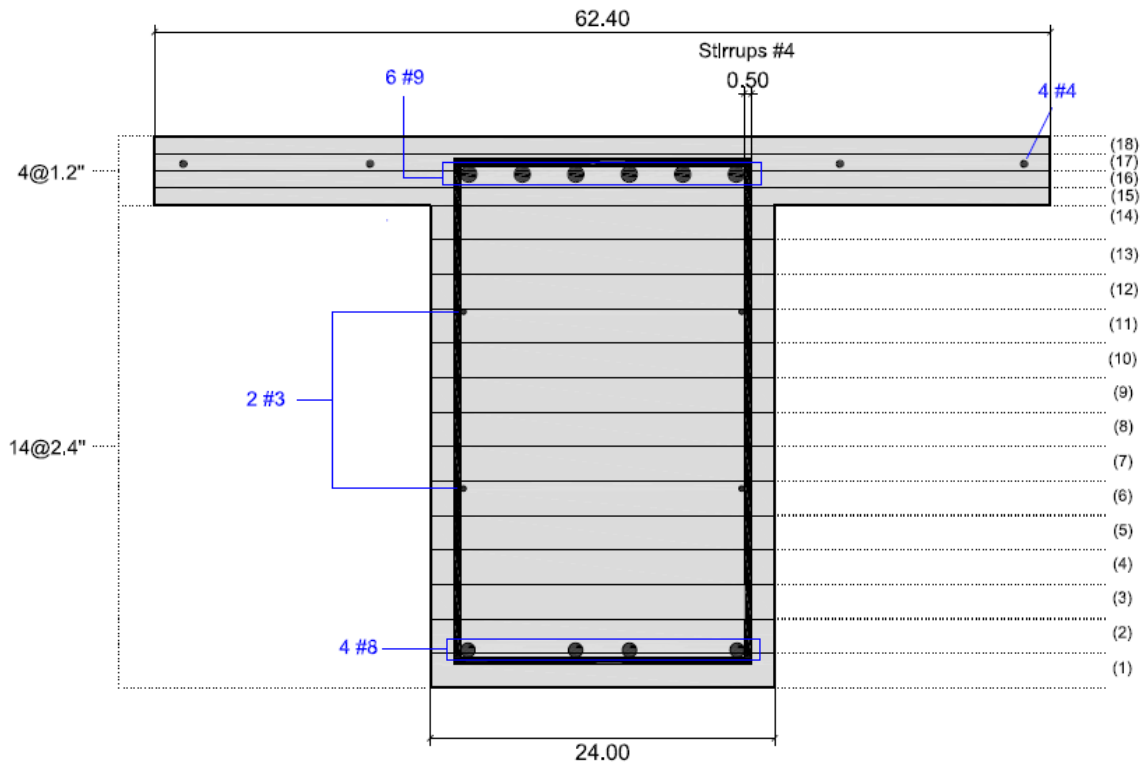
Cross section 4 for Specimen 6. Dimensions in inches.
